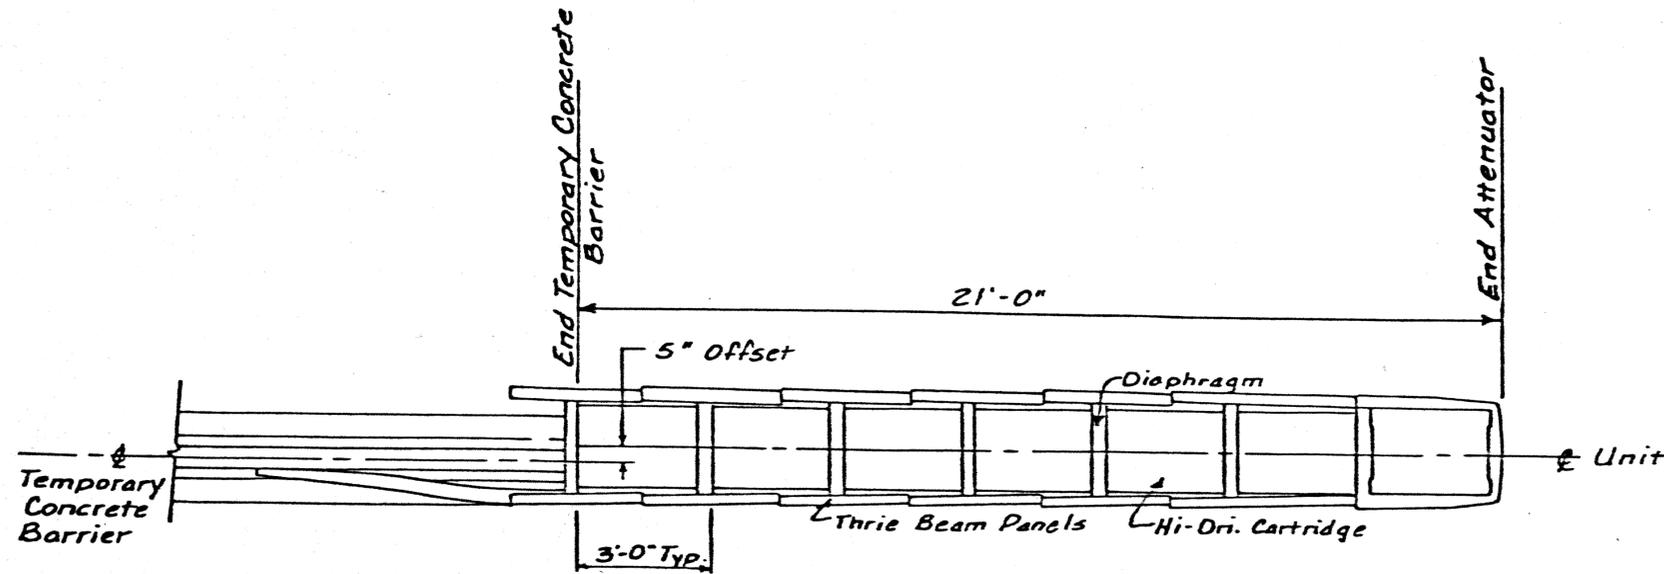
DETAIL AT STRUC. # 3227 (over Morse Rd.)
